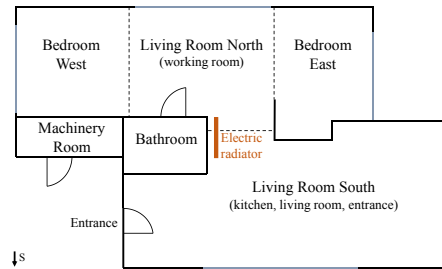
Floor plan of the ZEB Living Laboratory (dashed lines show borderlines of the zones; moving doors between bedrooms and Living Room North can be opened)
